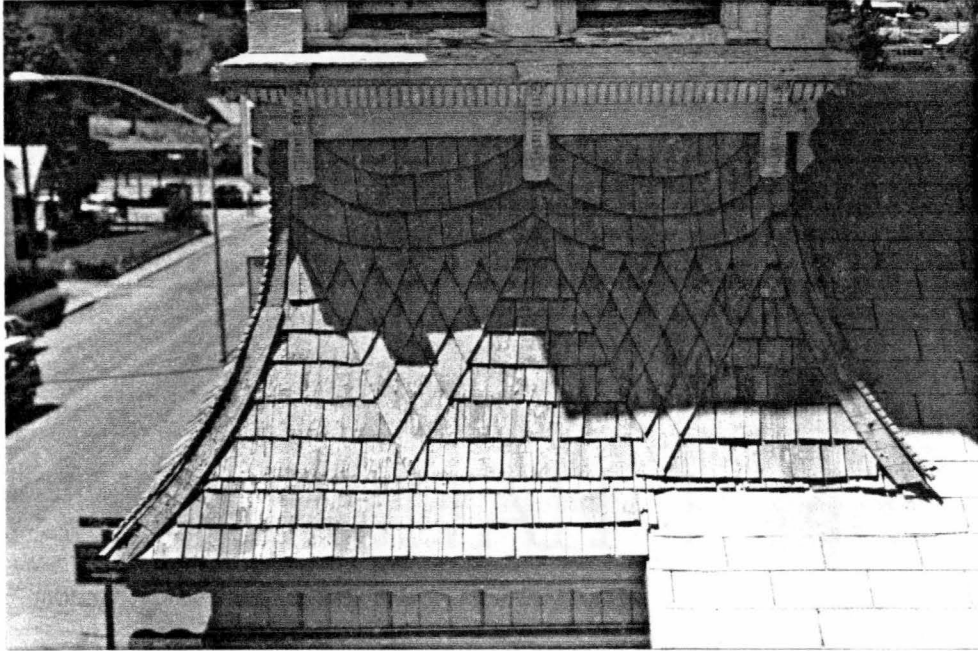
Intermediate bellcast roof of entrance tower.
